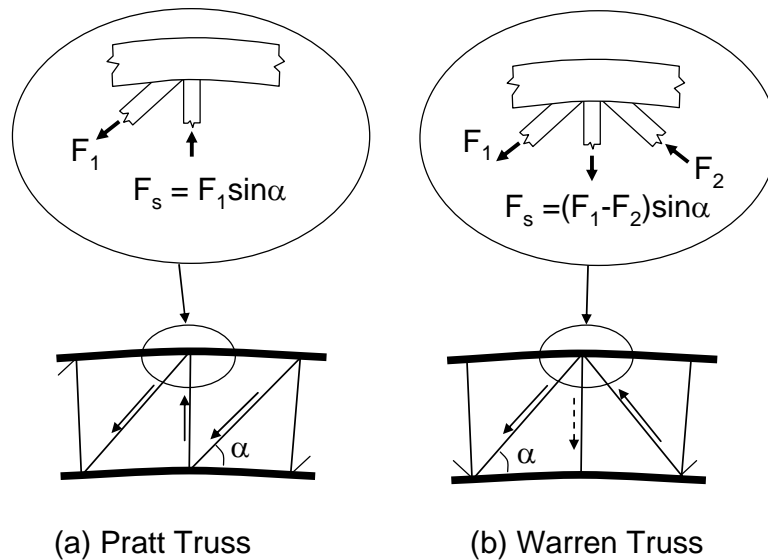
Role of Struts in Load Path of the Pratt and Warren Truss Systems
